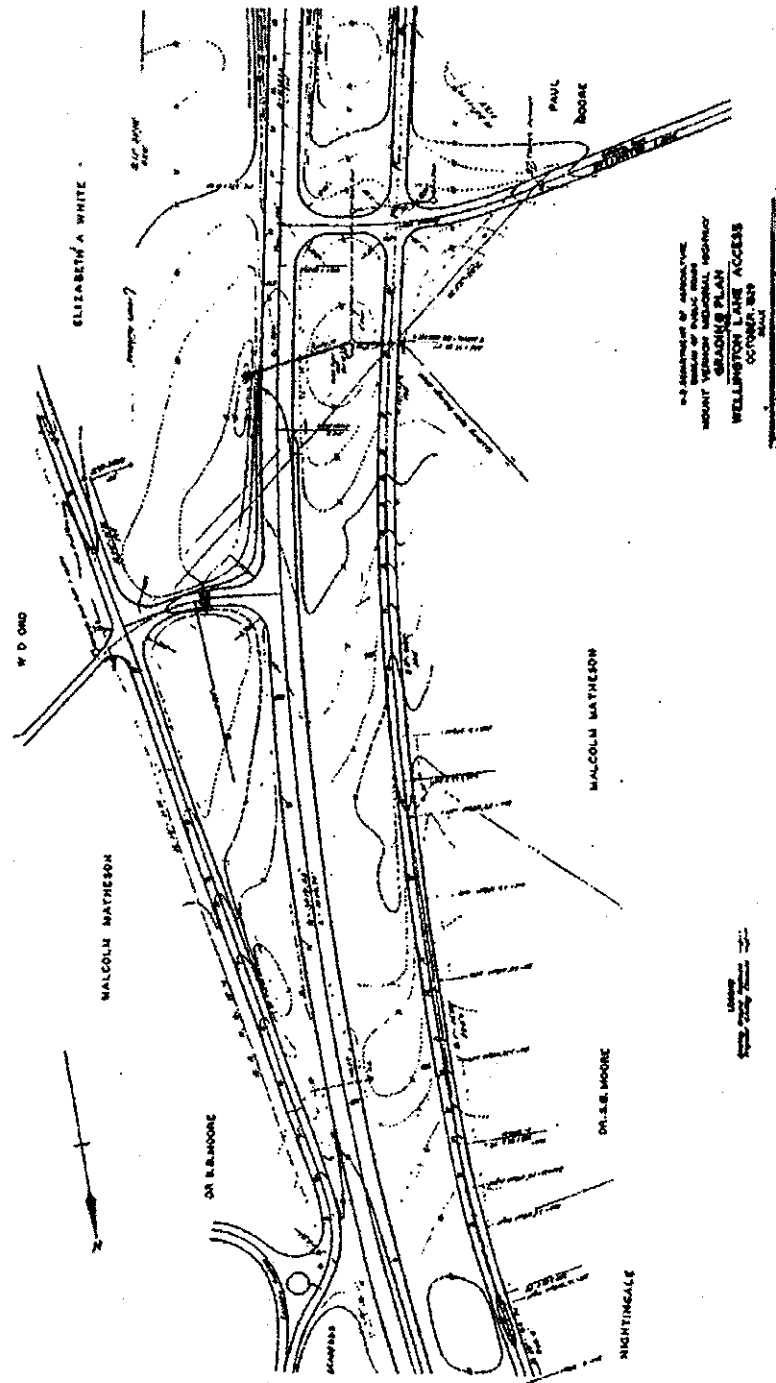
Where it has been necessary to provide crossings at grade and the curvature is too slight to permit dividing the roadway with pleasing lines, staggered outlets have been used. Saggered outlets permit traffic to cross the traffic lanes on one-half of the highway and then flow with and weave across the traffic on the other half to an exit. The distance provided for the weaving of traffic across the half width of the pavement is approximately 400 feet, or the equivalent of a city block.
